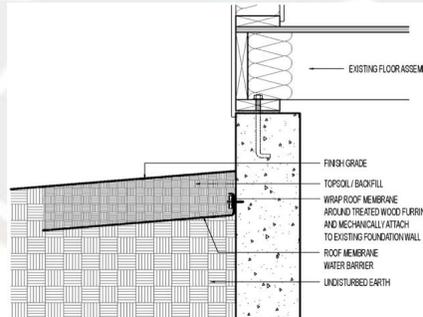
Concrete Crawlspace Wall with Exterior Insulation
